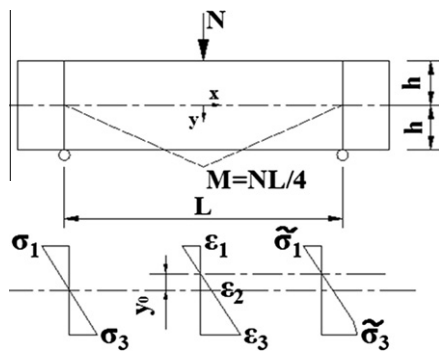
Flexural damage of rectangular concrete beam.
